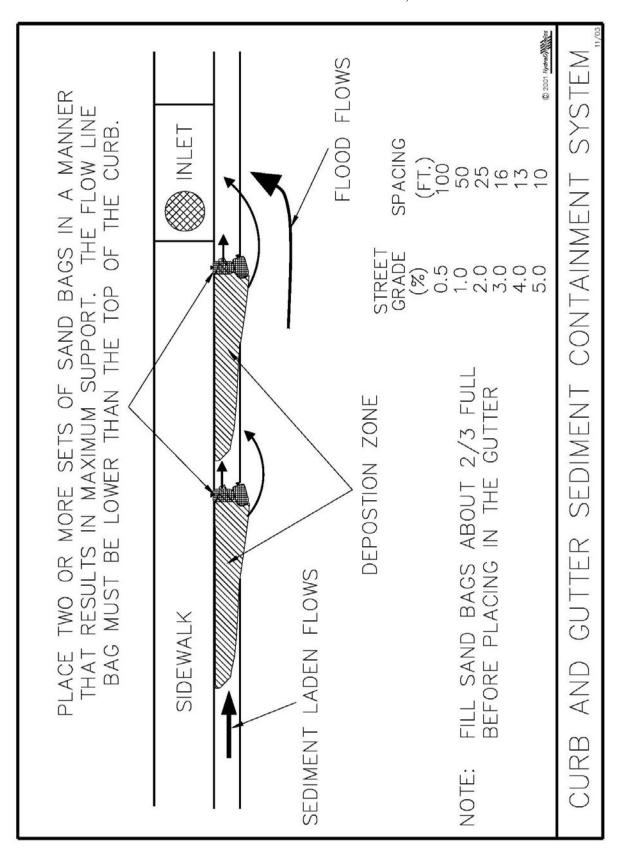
Illustration of a Curb and Gutter Sediment Containment System
